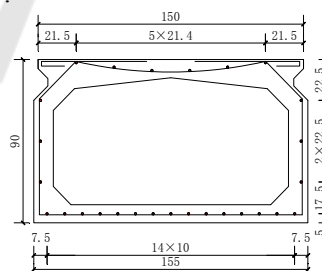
the transverse section of thin wall hollow slab (unit: cm)
